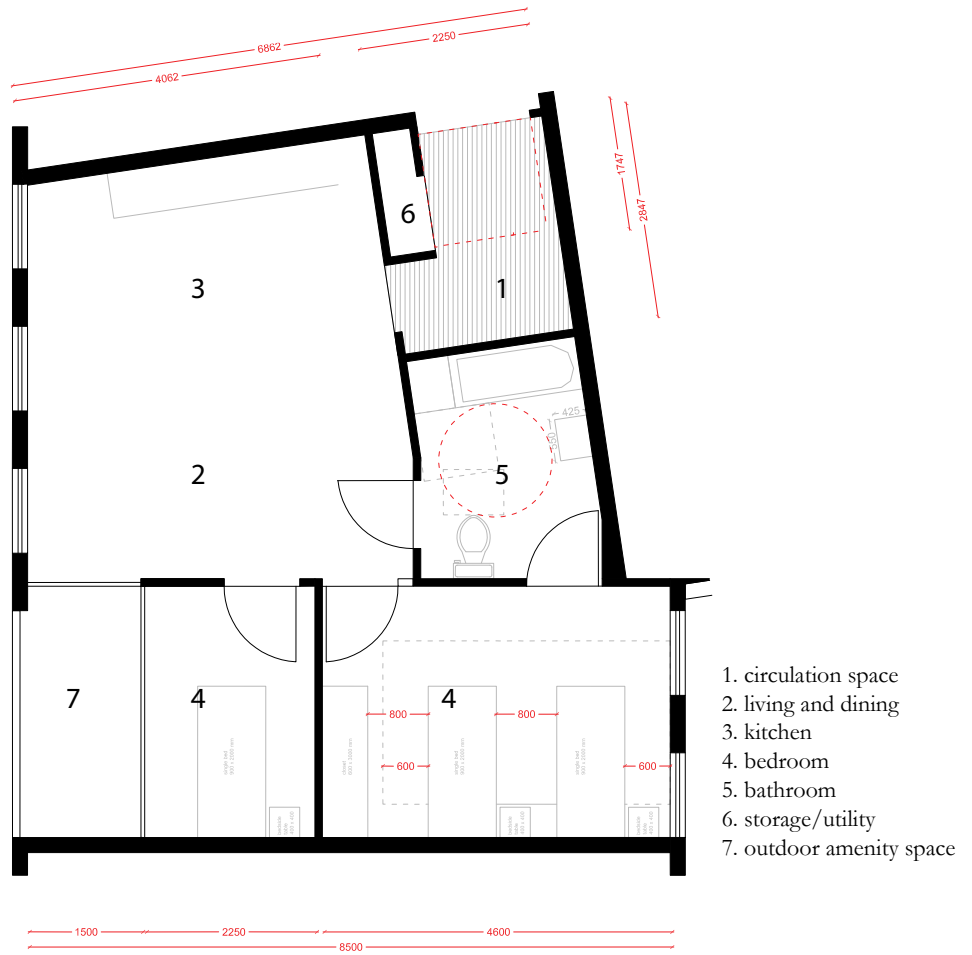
New floor plan (scale 1:100) and organization scheme of the 2b3p-flat
